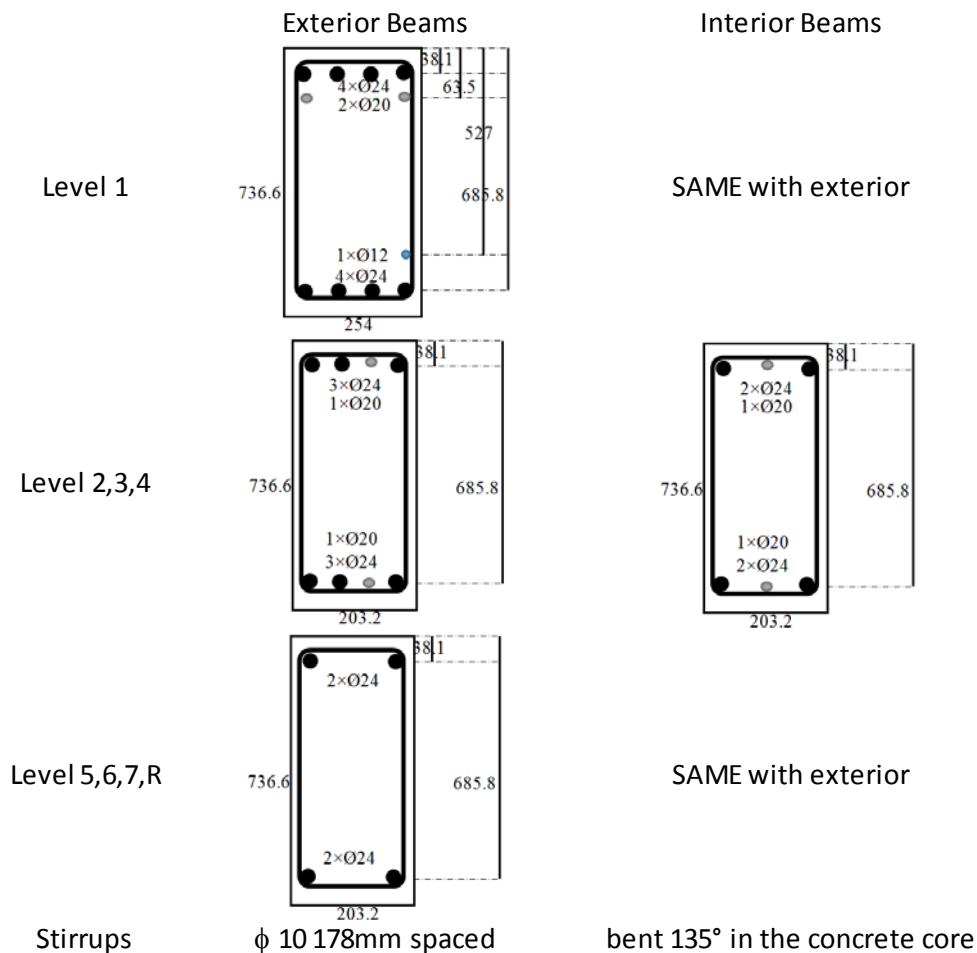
Beam details in Frame 1 (redrawn, Chen 2015).
